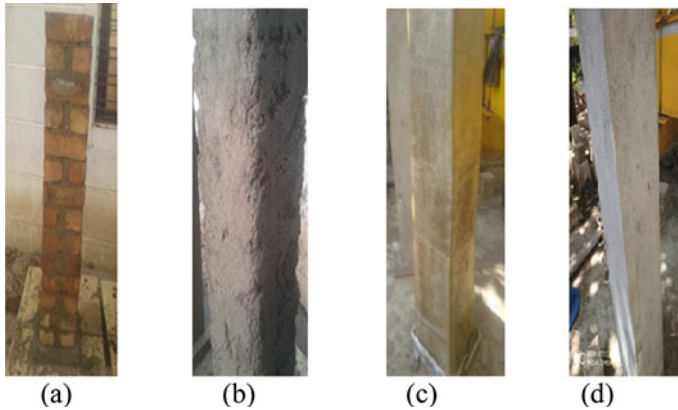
a Brick column, b brick column with plaster, c GFRP confinement of brick masonry column and d chicken wire mesh FRCM confinement of brick masonry column
